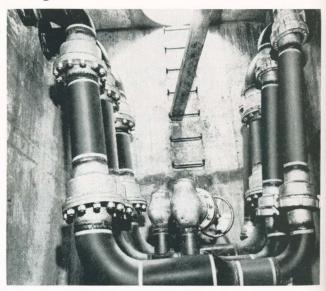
Ball joint installation in the high-temperature water system manholes.
